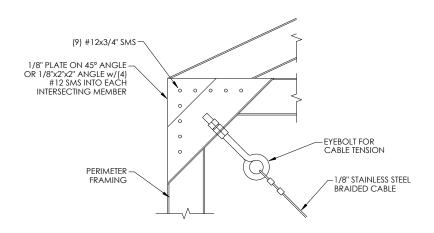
DETAIL "K" GUSSET CONNECTION SCALE: NTS
